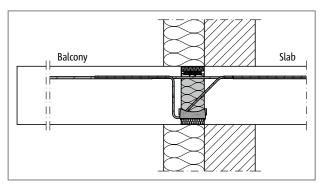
Schöck Isokorb® T type K: Connection with thermal insulation composite system (WDVS)
